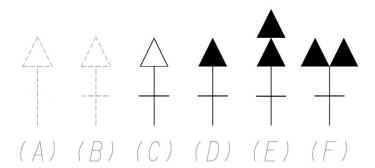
Typical Signal Head Cells: (A) Existing 3 Section Signal Head Without Back Plate, (B) Existing 3 Section Signal Head with back plate (C) Shifted 3 Section Signal Head, (D) Proposed 3 Section Signal Head, (E) Proposed Vertical 4 Section Signal Head, (F) Proposed T-Shaped/5-Section Signal Head
